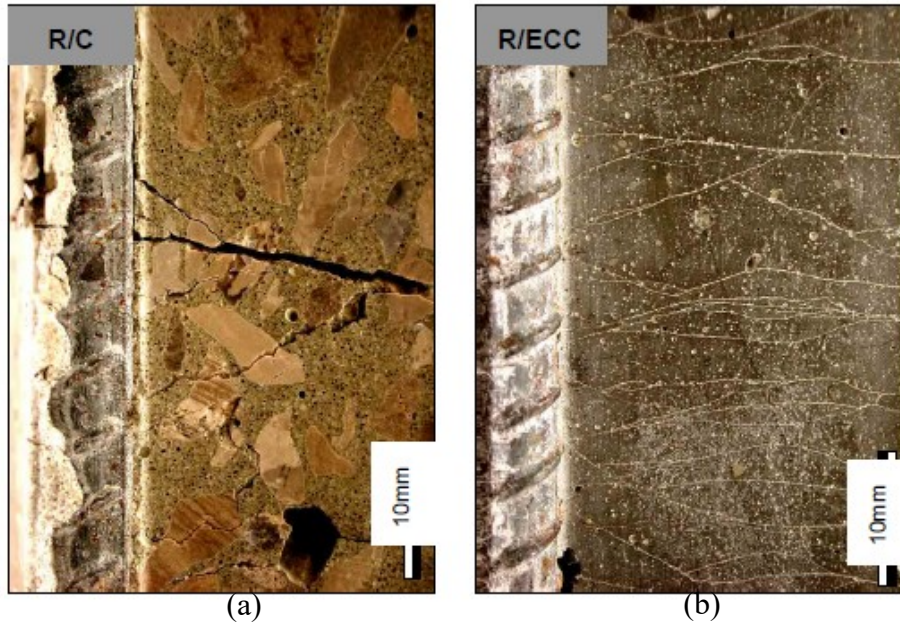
Cracking mechanisms of (a) concrete, and (b) ECC (Li, 2003)
